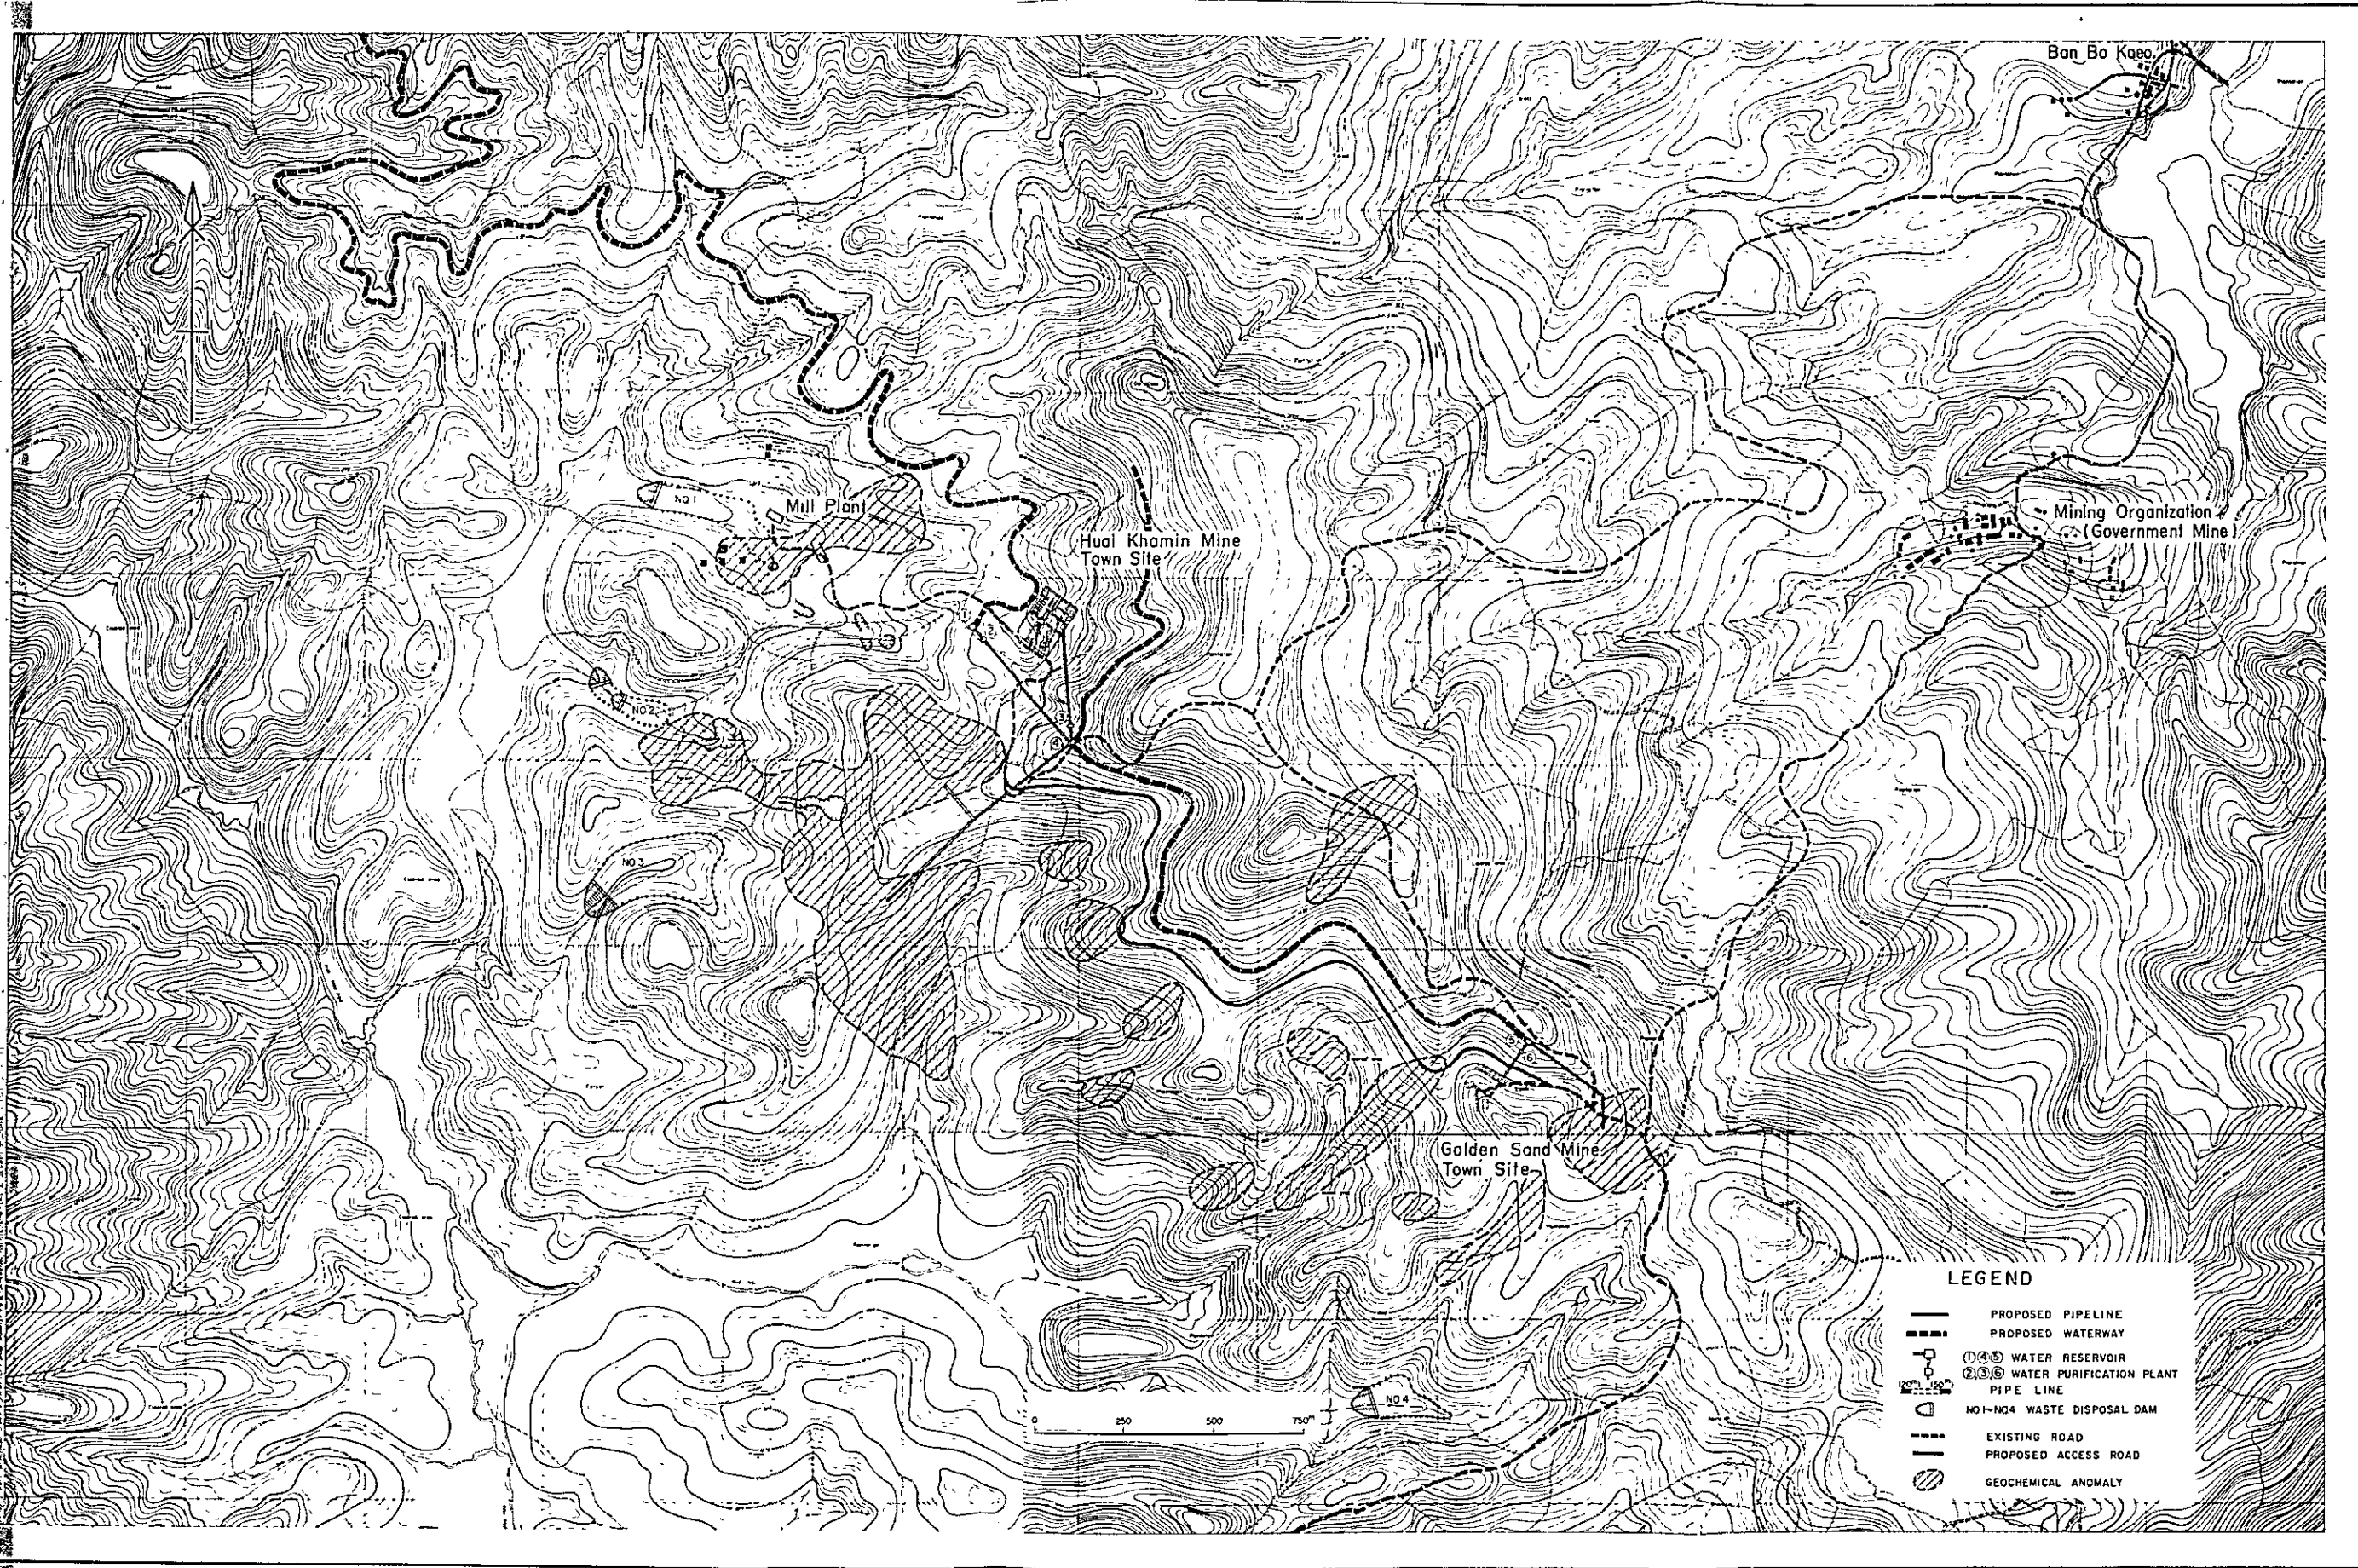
Proposed Mine Town, Waterway, Dam and Road
